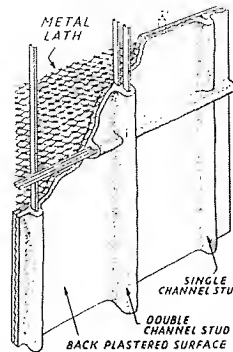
Vertical and Horizontal Ribs Reinforce Wall.
